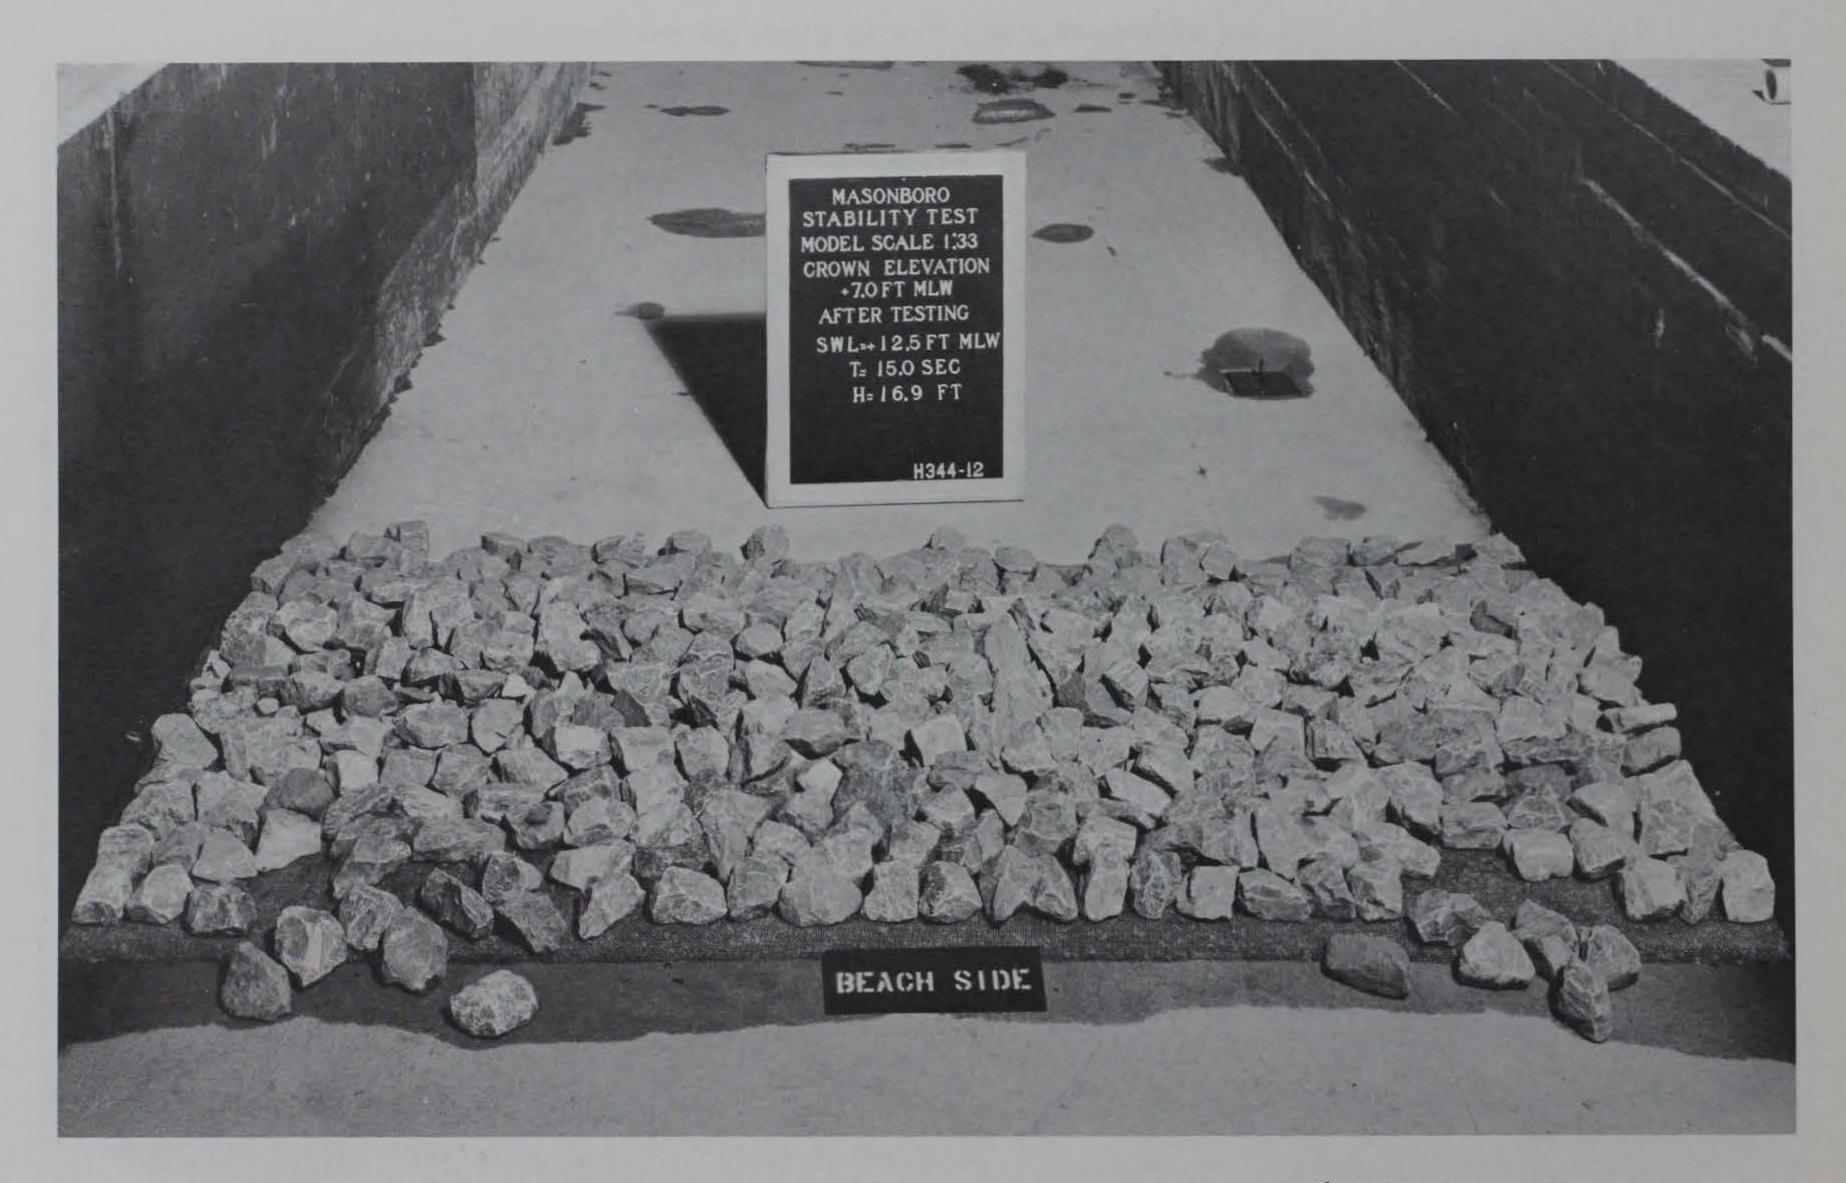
Beach-side view of Plan 3 after attack of 15-sec, 16.9-ft waves at an swl of +12.5 ft mlw for 2 prototype hr
